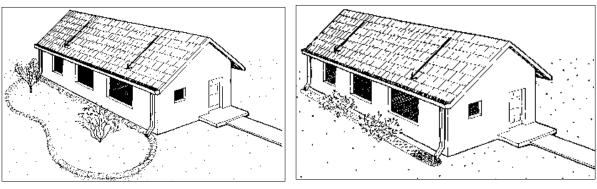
Rainwater from gutter downpipes routed to bermed planting area (Waterfall, undated)
